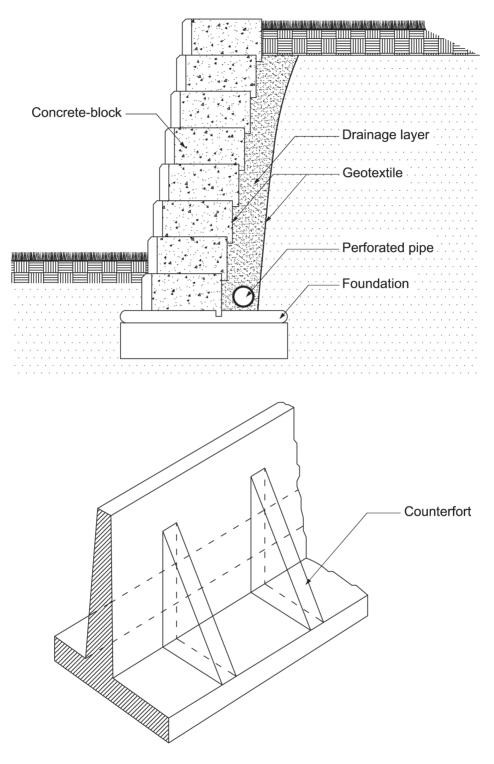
Concrete-block retaining wall (left) and counterfort retaining wall (right)
